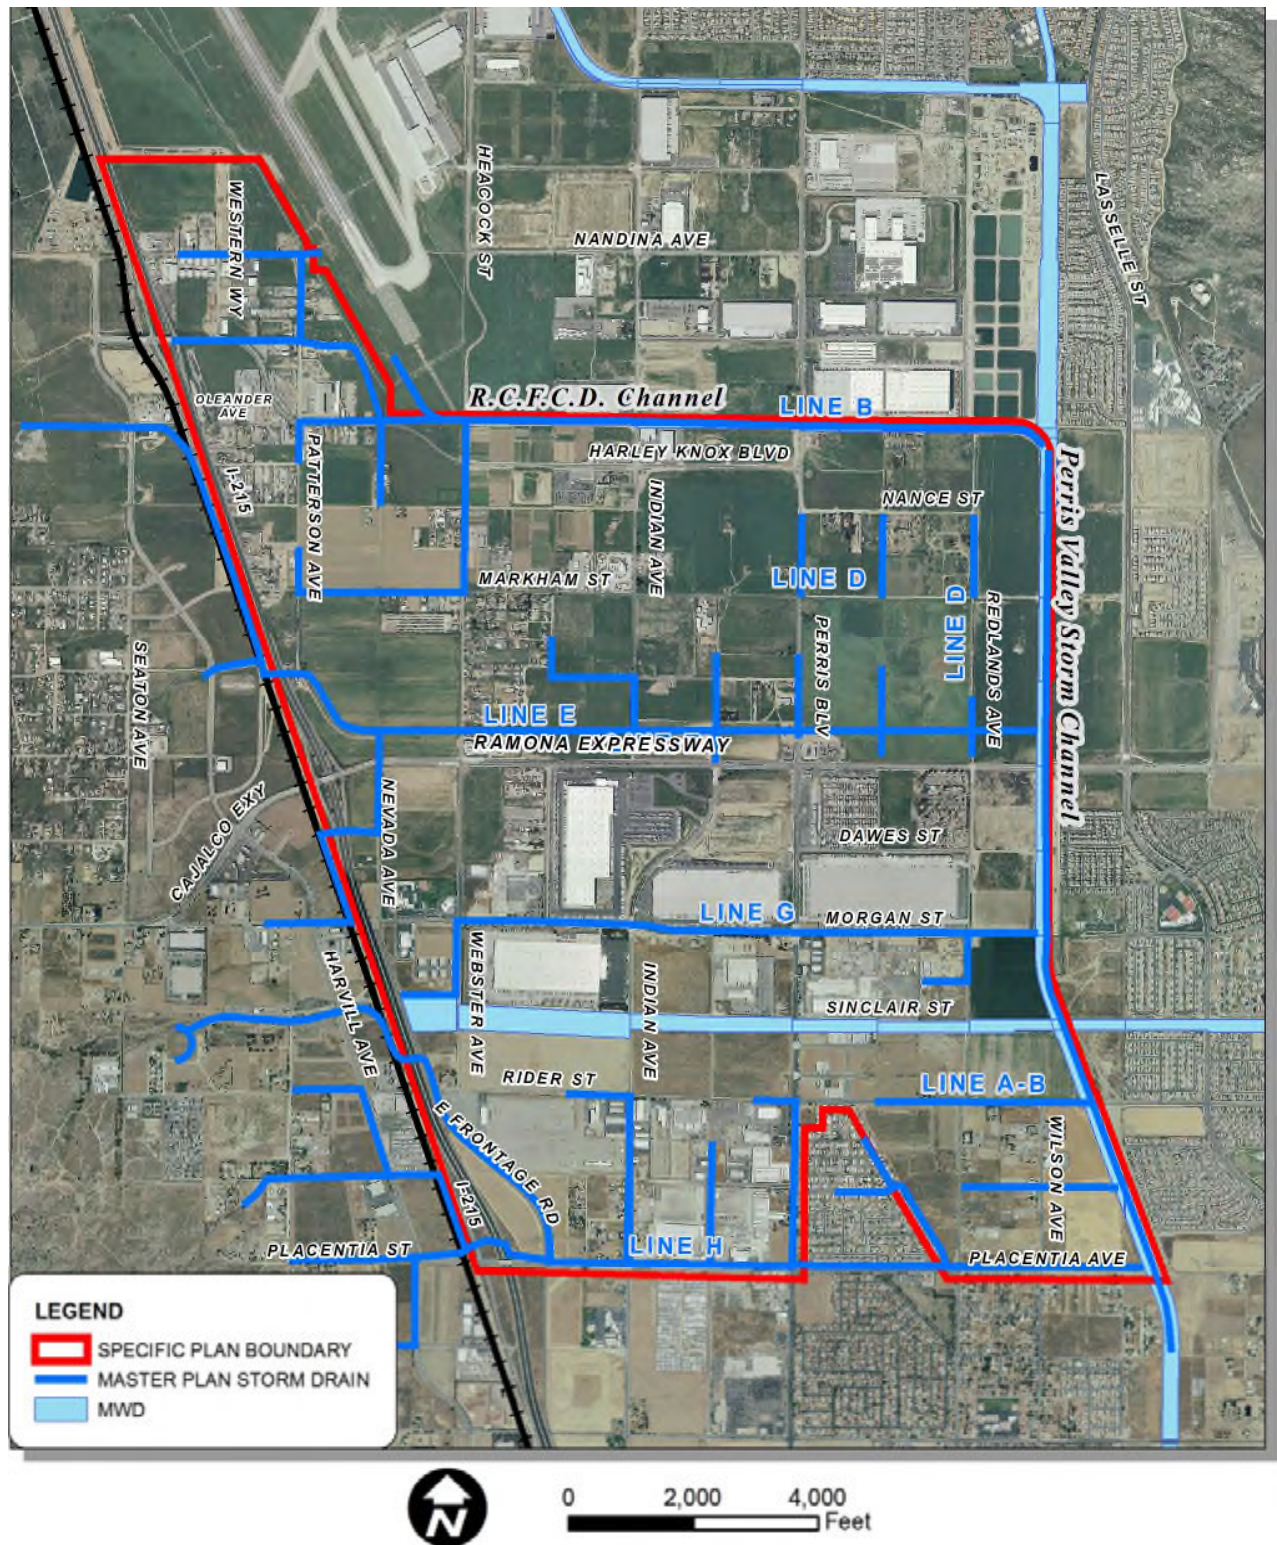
EXISTING STORM DRAIN PLAN
